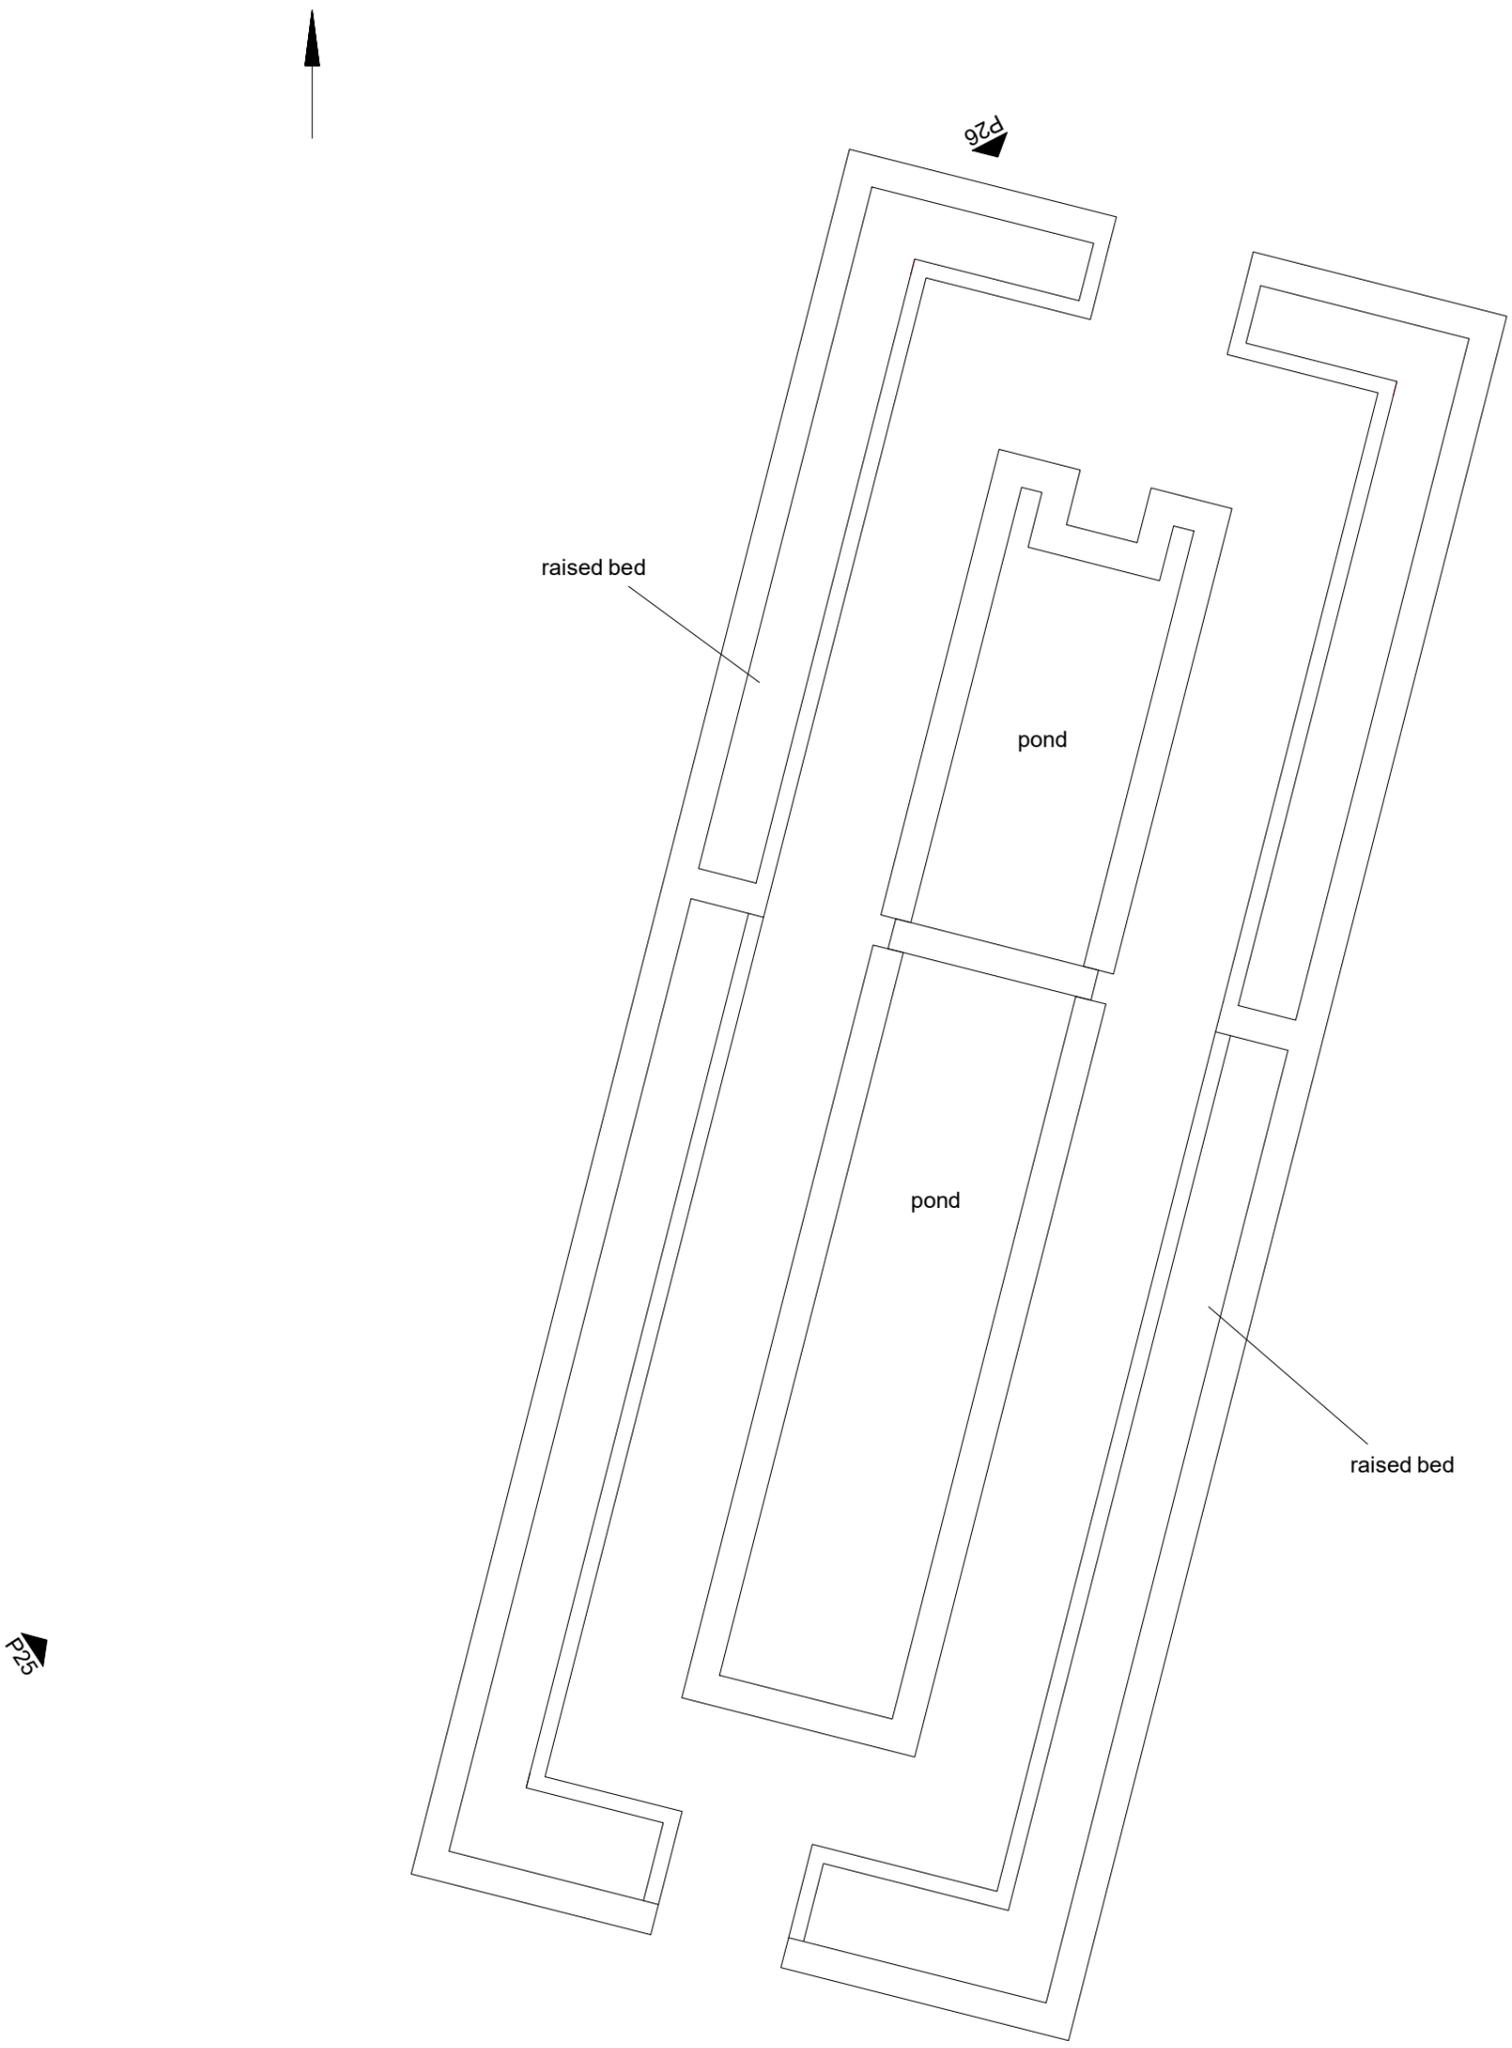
Glasshouse base B floor plan. Location and direction of photographs reproduced in text shown.
